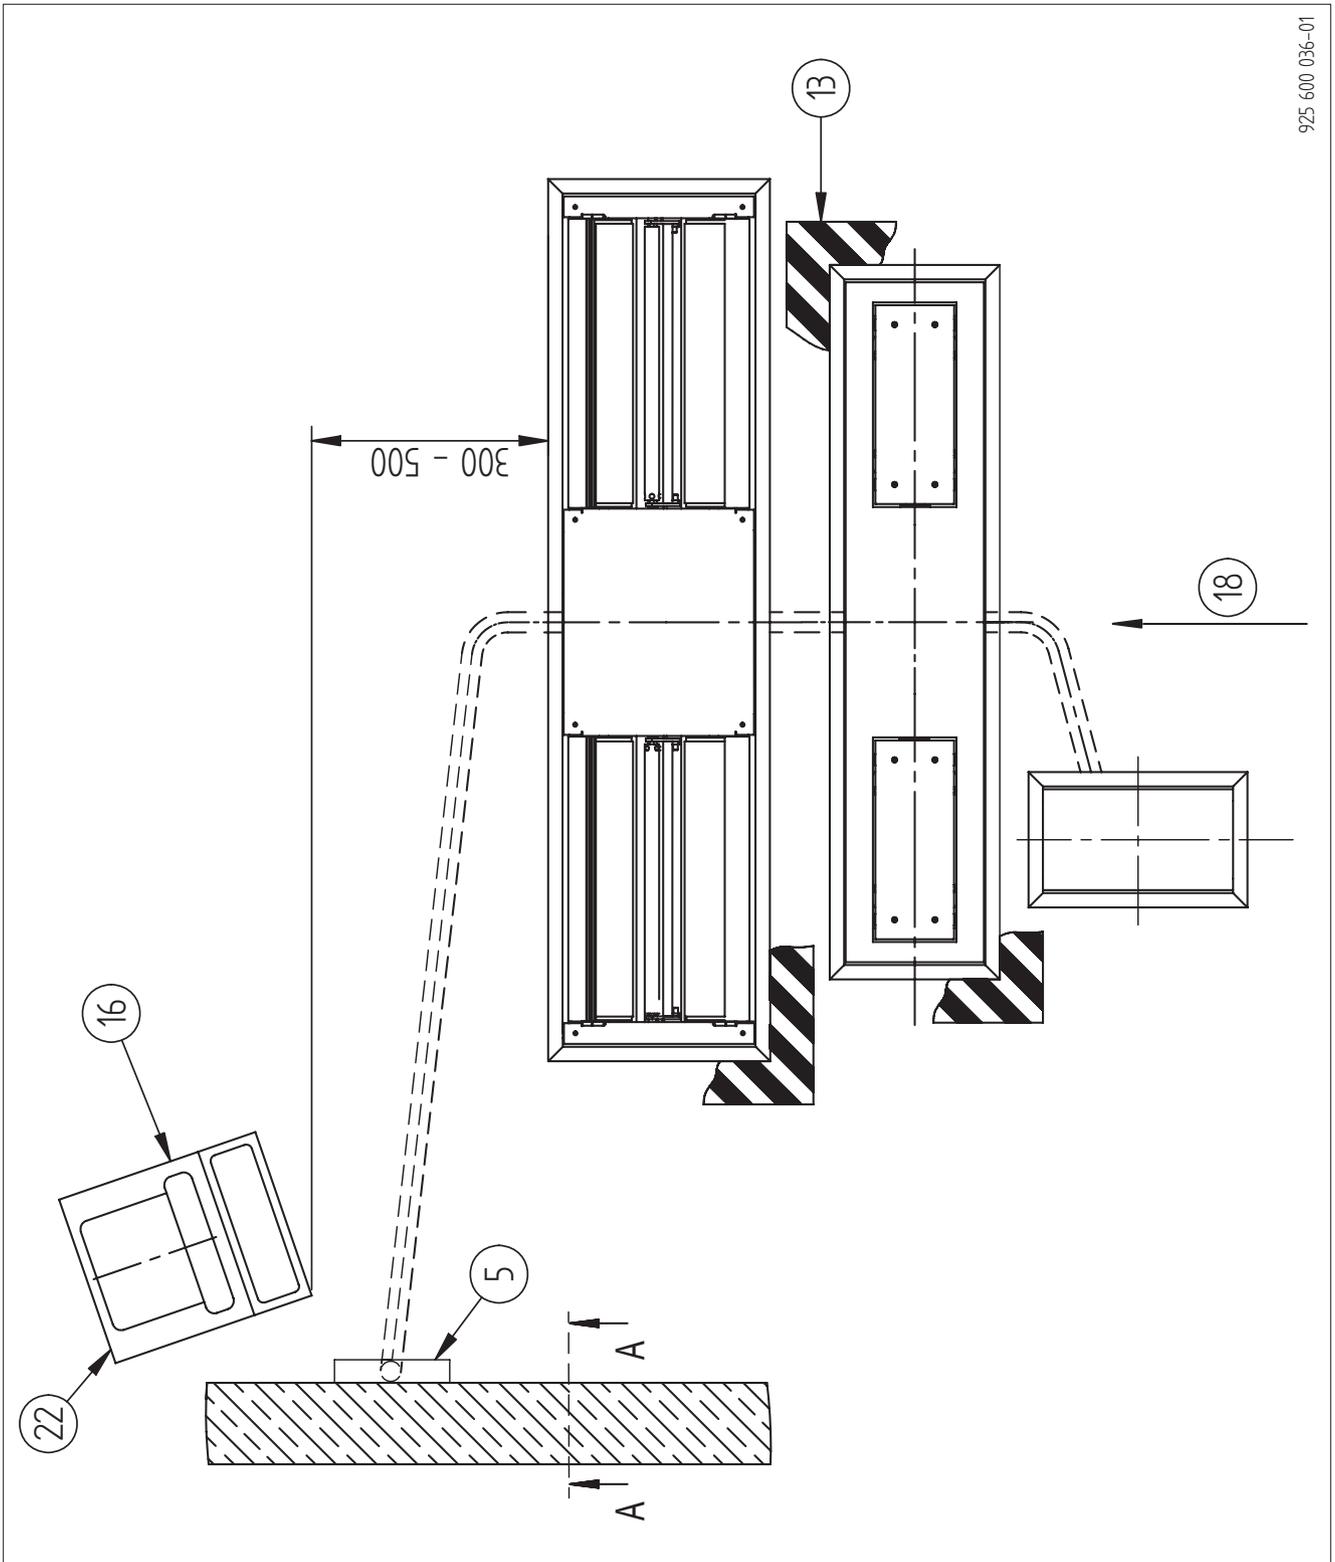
Installation plan BD 660 with PC, suspension tester and side slip tester - Ground plan
